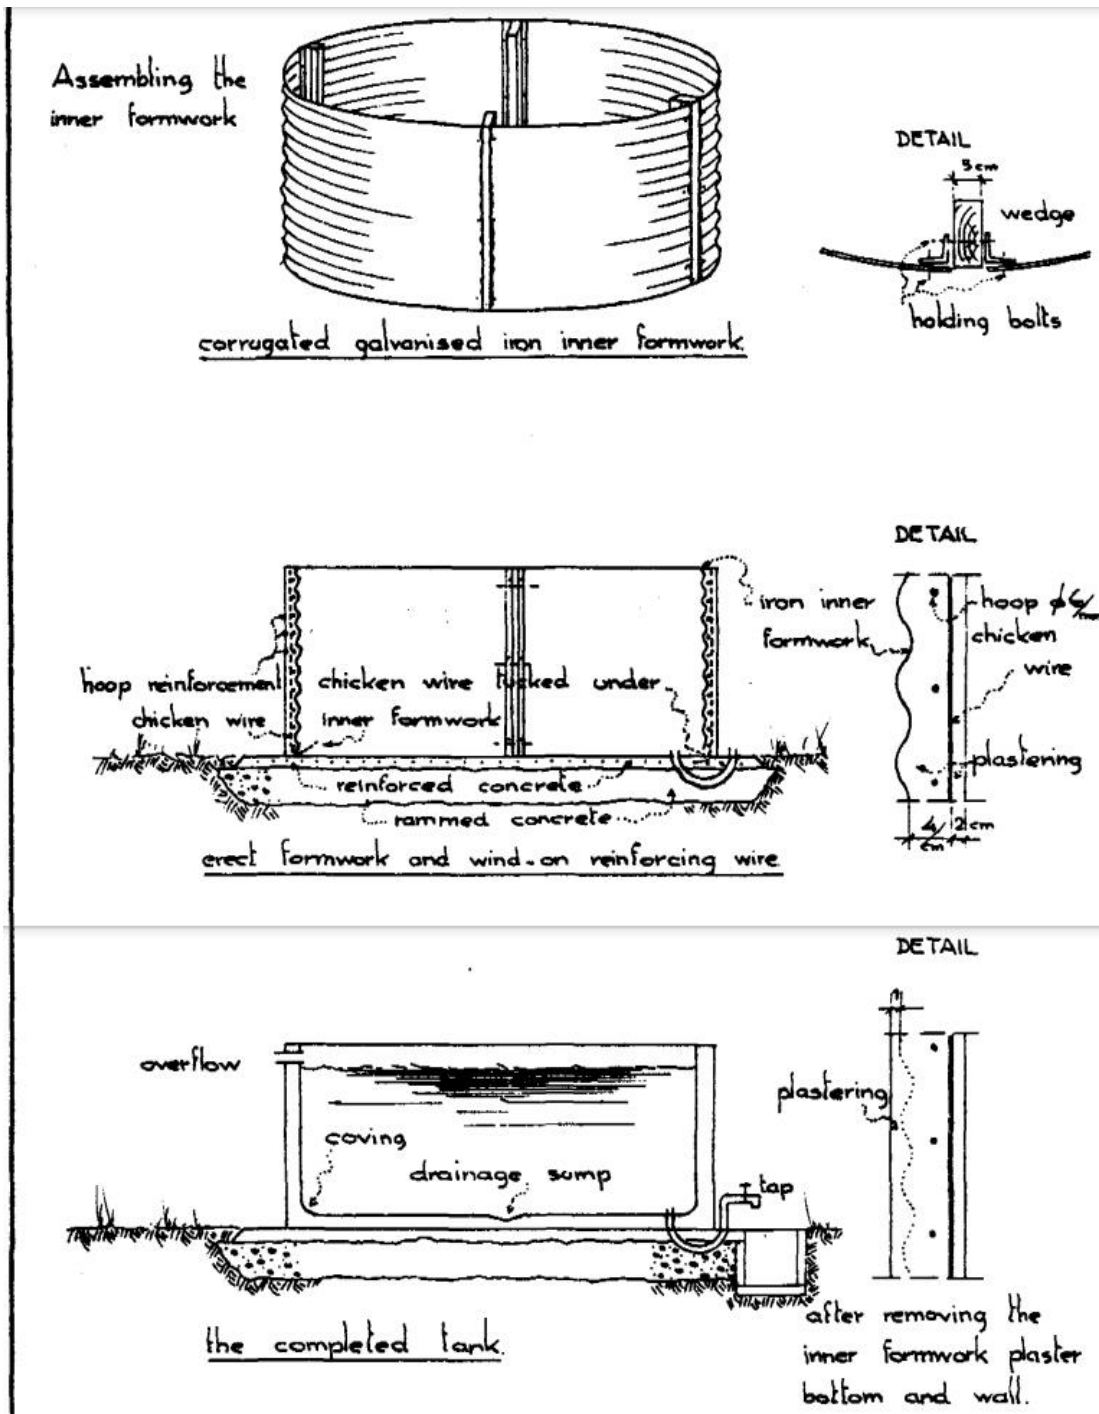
Watt, S.B. (1978). Ferrocement water tanks and their construction (IRC International Water and Sanitation Centre, 1990).
